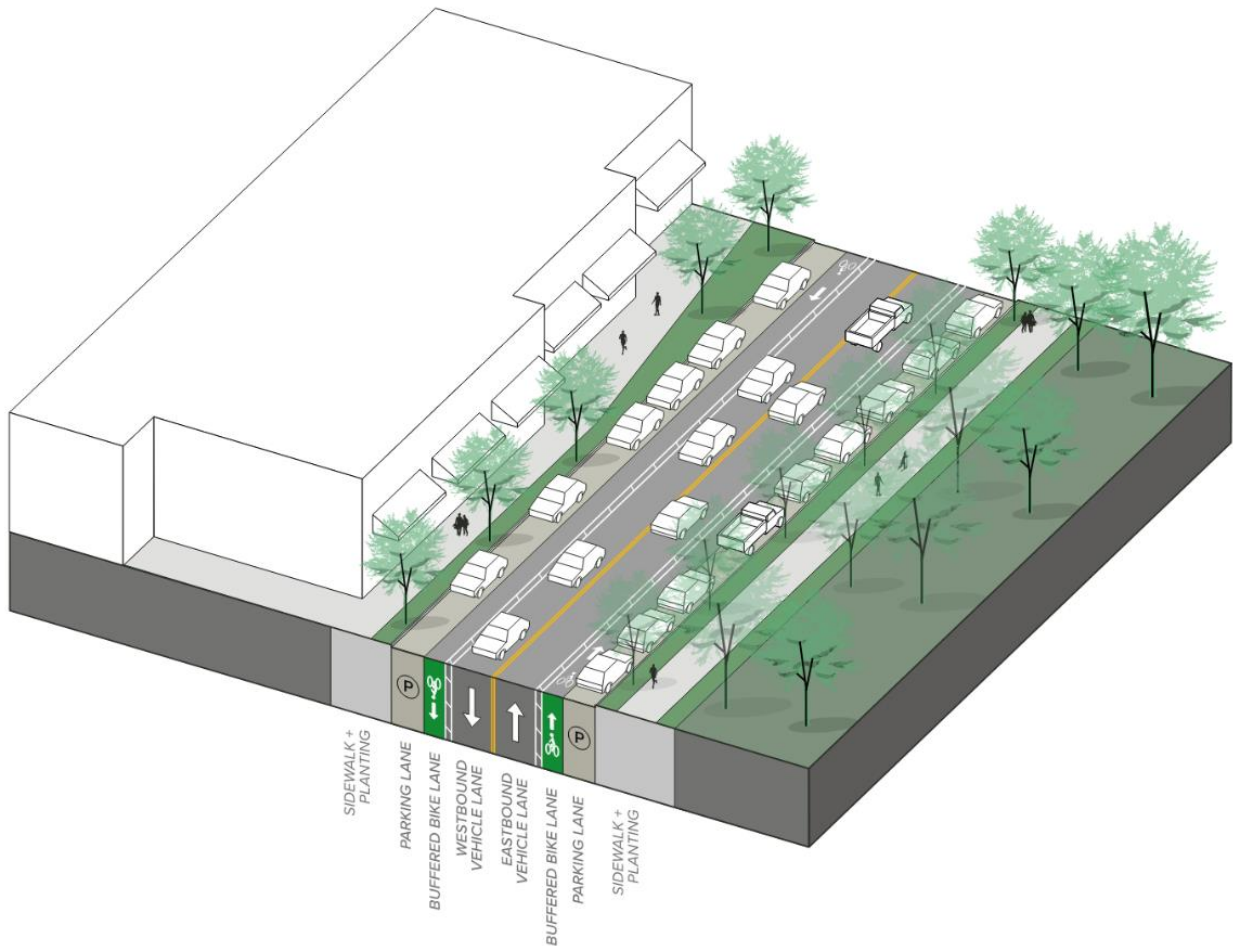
B Street West of Montgomery Avenue Reimagined Corridor Cross-Section
